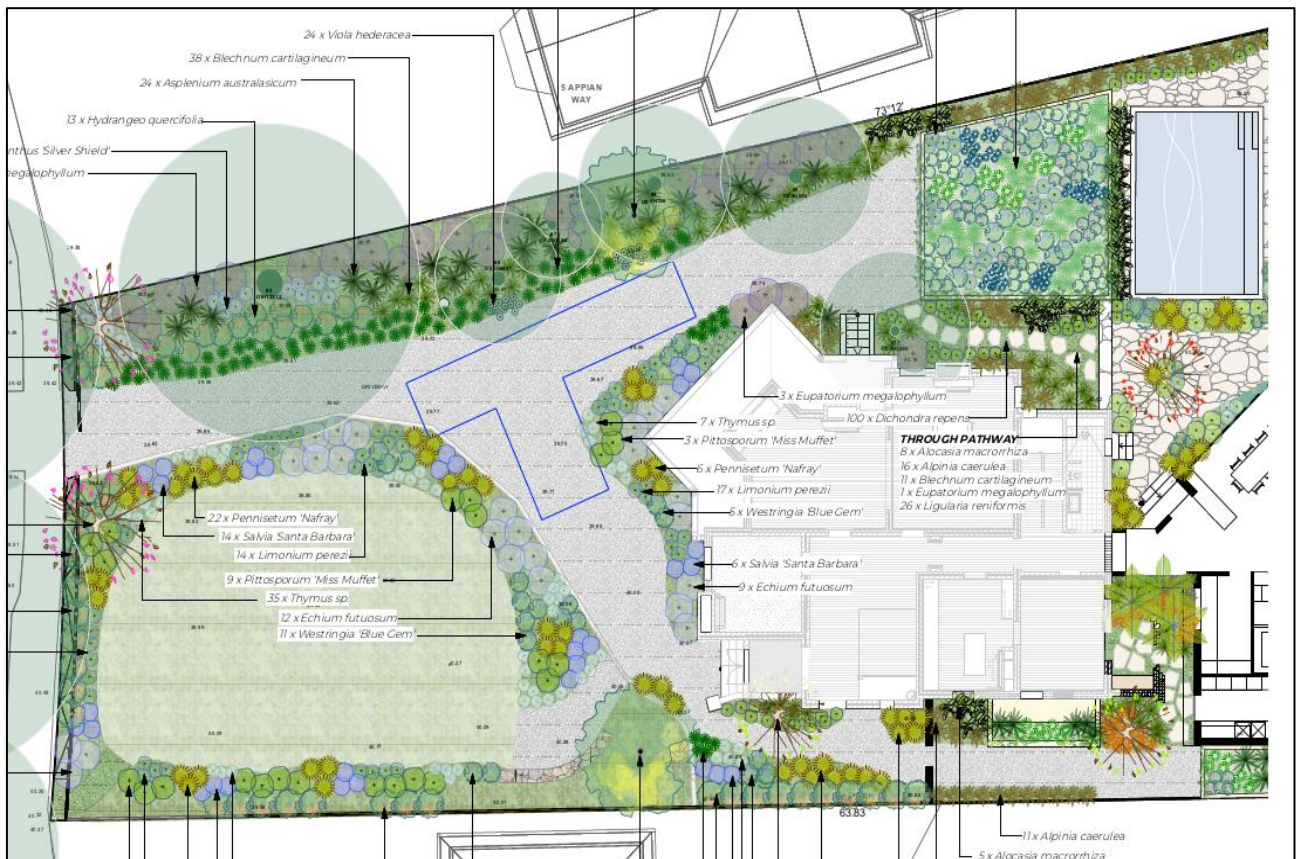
Extract of the applicant’s submitted Landscape Plan. Source: (*Melissa Wilson Landscape Architects*)
